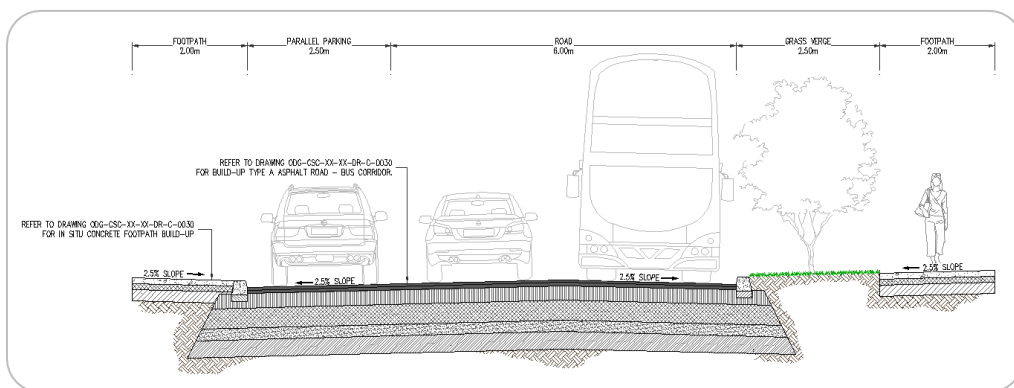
Proposed Boulevard cross-section (with on-street parking)
